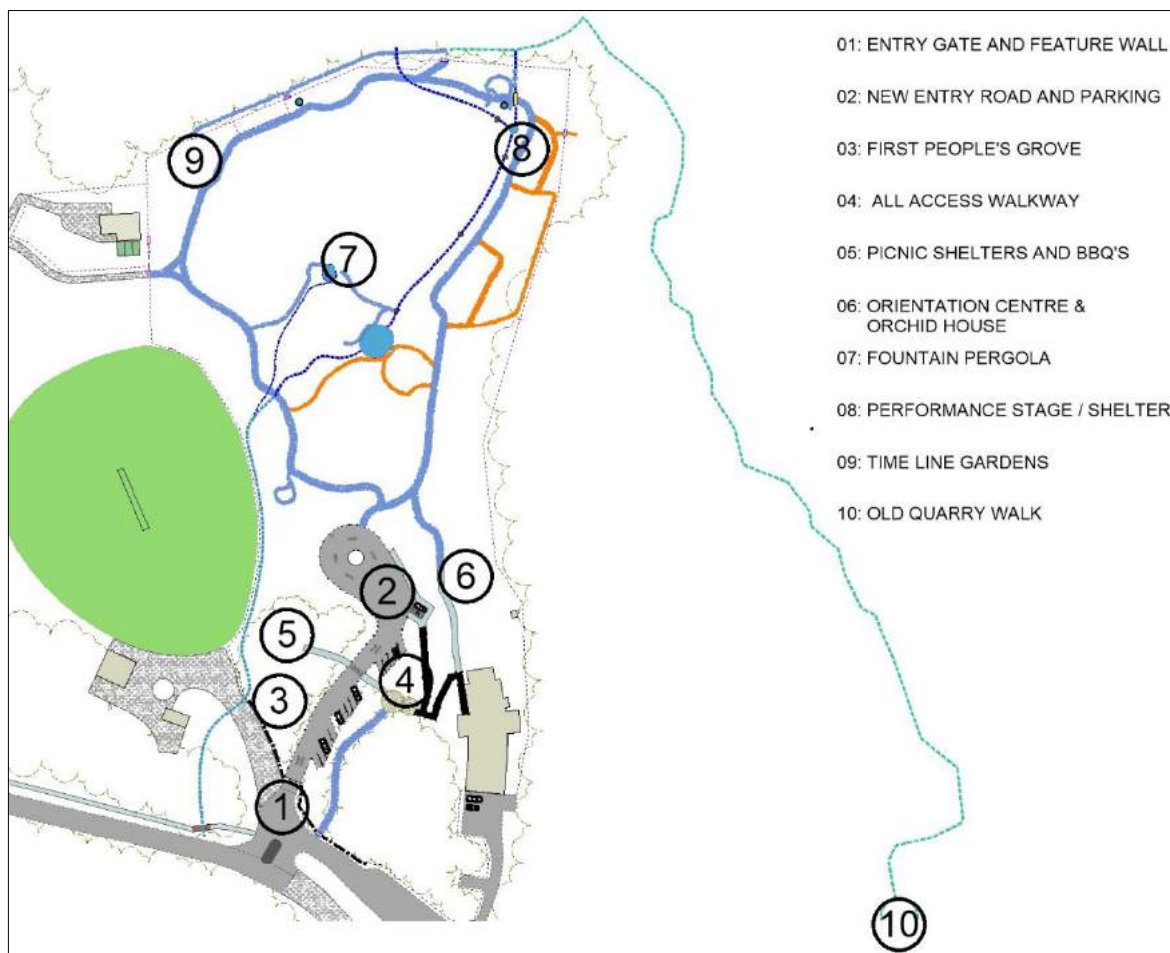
New Feature locations – refer to Section 7.4 for full size plan
